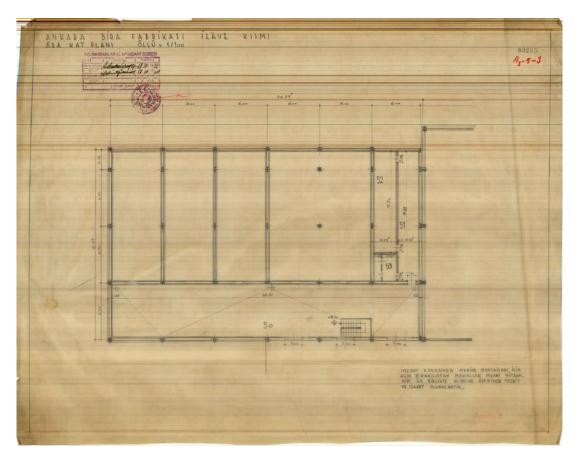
Drawing of the addition on the west of the beer settling building, the first floor plan, Adnan Kuruyaz, Construction Section in General Directorate of TEKEL, 1939 (Source: TTA Archive)
